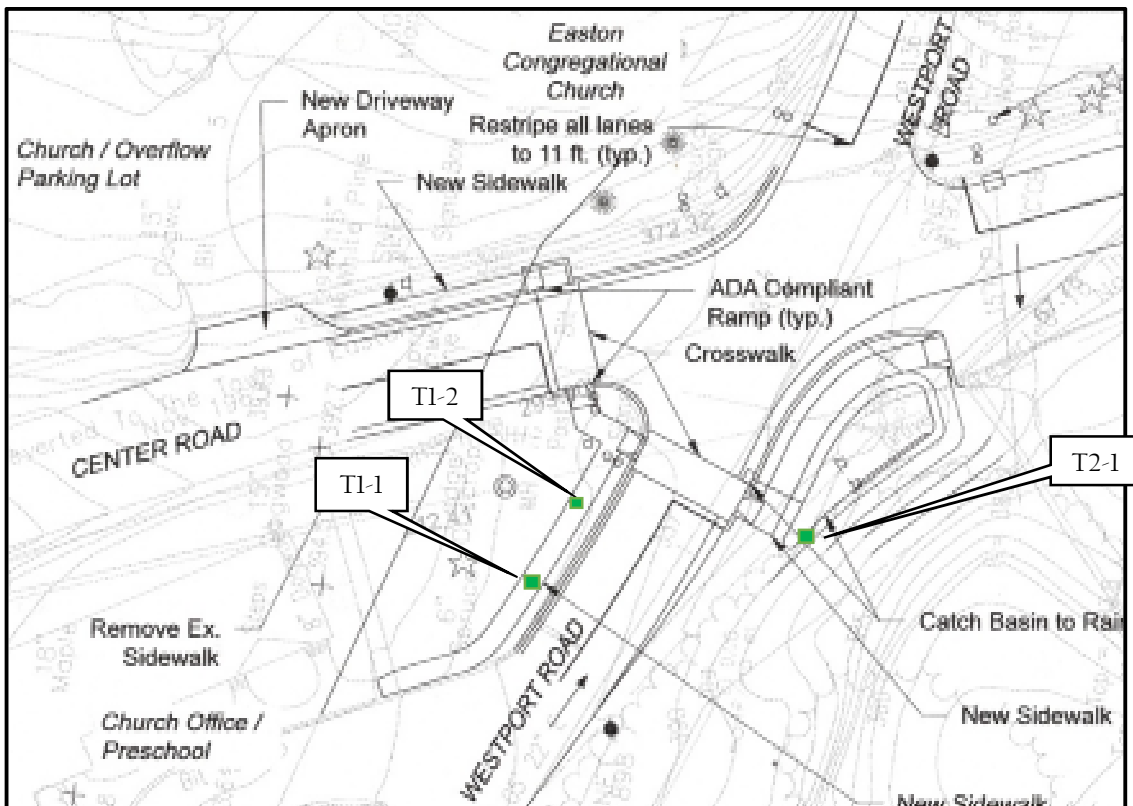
Placement of subsurface test pits. T2-1 is located adjacent to northernmost edge of Site #46-98 stonewall. (base map - Force Engineering and Construction, LLC)
